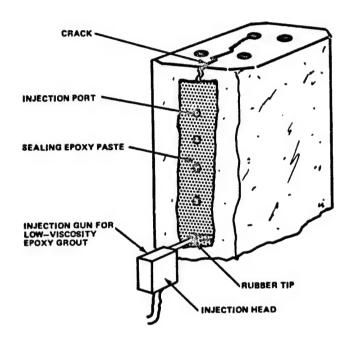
Typical Crack Repair with Epoxy Grout Injection.
